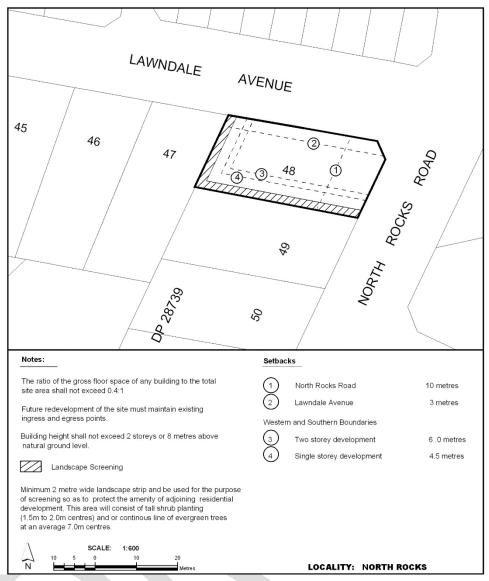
Setback requirements for land on the corner of Lawndale Avenue and North Rocks Road, North Rocks (355 North Rocks Road, North Rocks)
